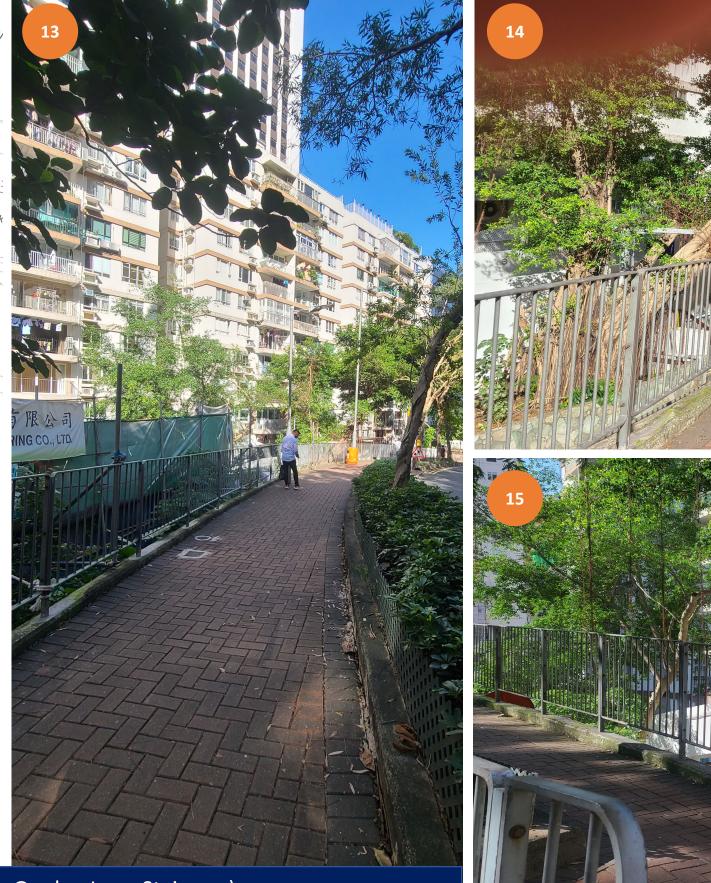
EXISTING SITE CONDITIONS (Spring Garden Lane Staircase)
